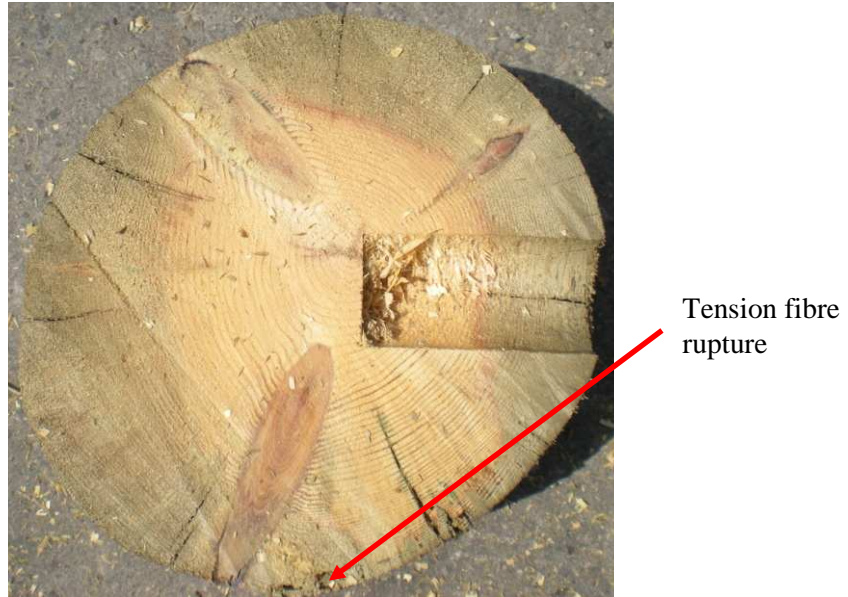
Cross-section of new pole specimen with neutral axis exploratory damage (50-2-3).
